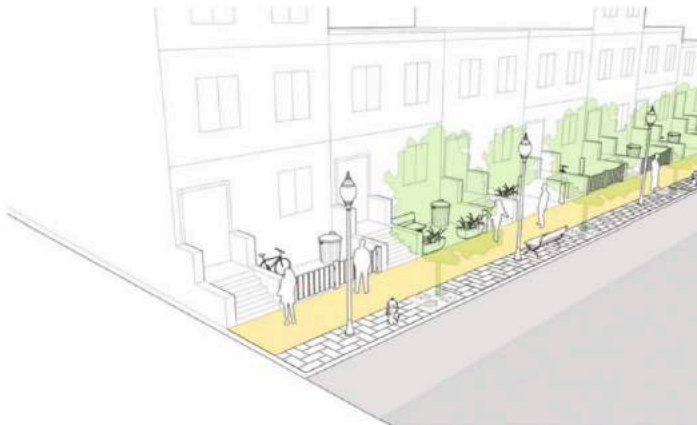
Sidewalk Overview Diagrams (NACTO)
